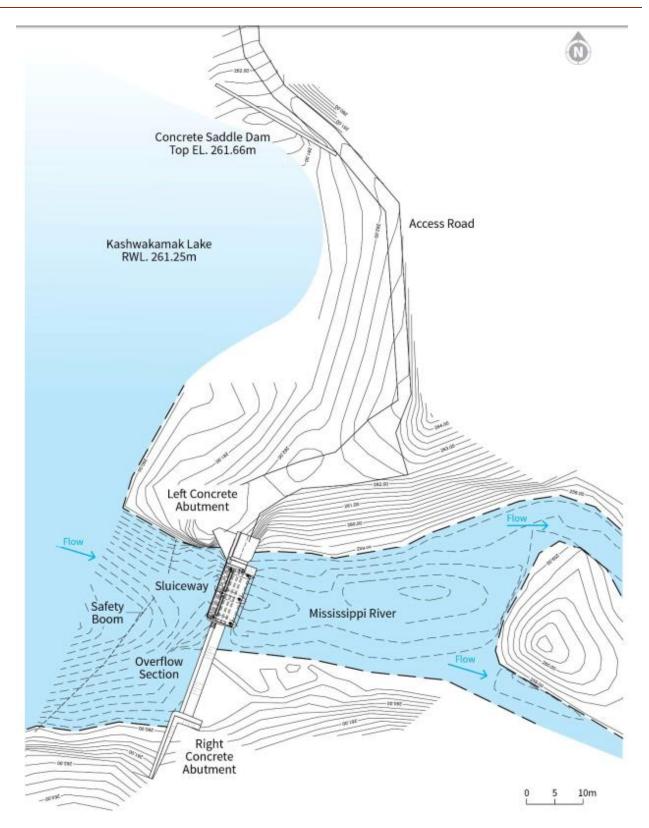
Detailed Site Layout – Kashwakamak Lake Dam, Township of North Frontenac (Hatch, 2022)
